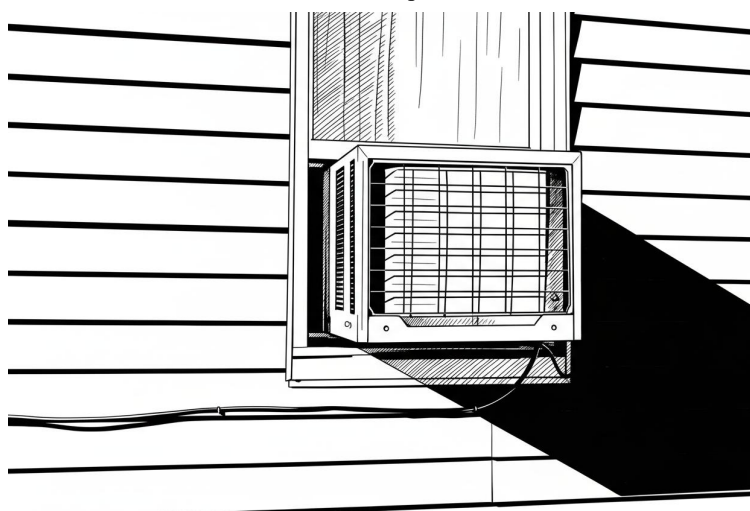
ROOM AC INSTALLATION – WALL MOUNTED
